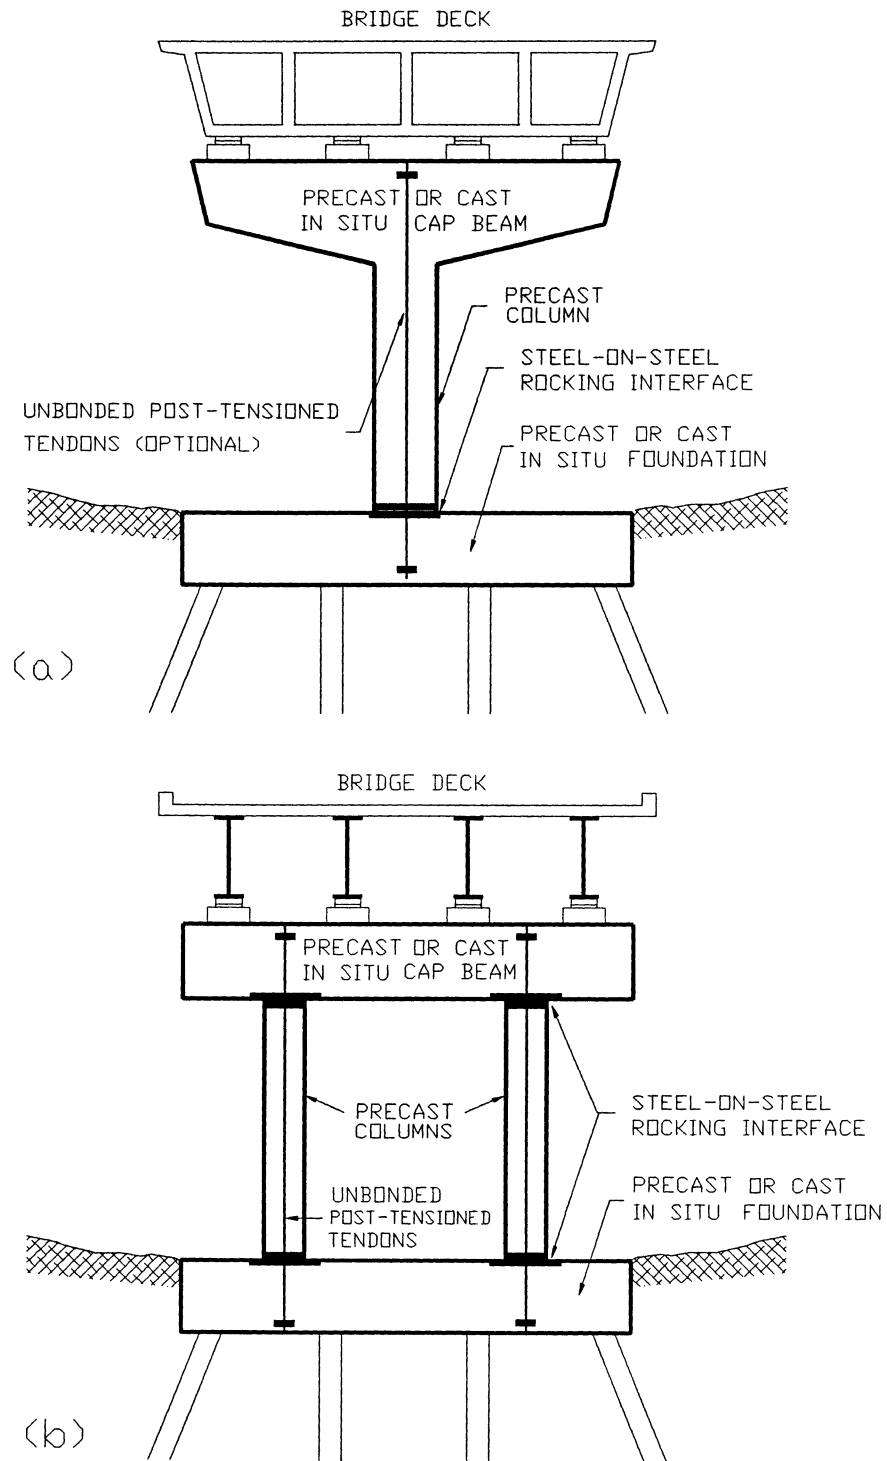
Salient construction details of the proposed new approach to seismic design of bridge piers.
